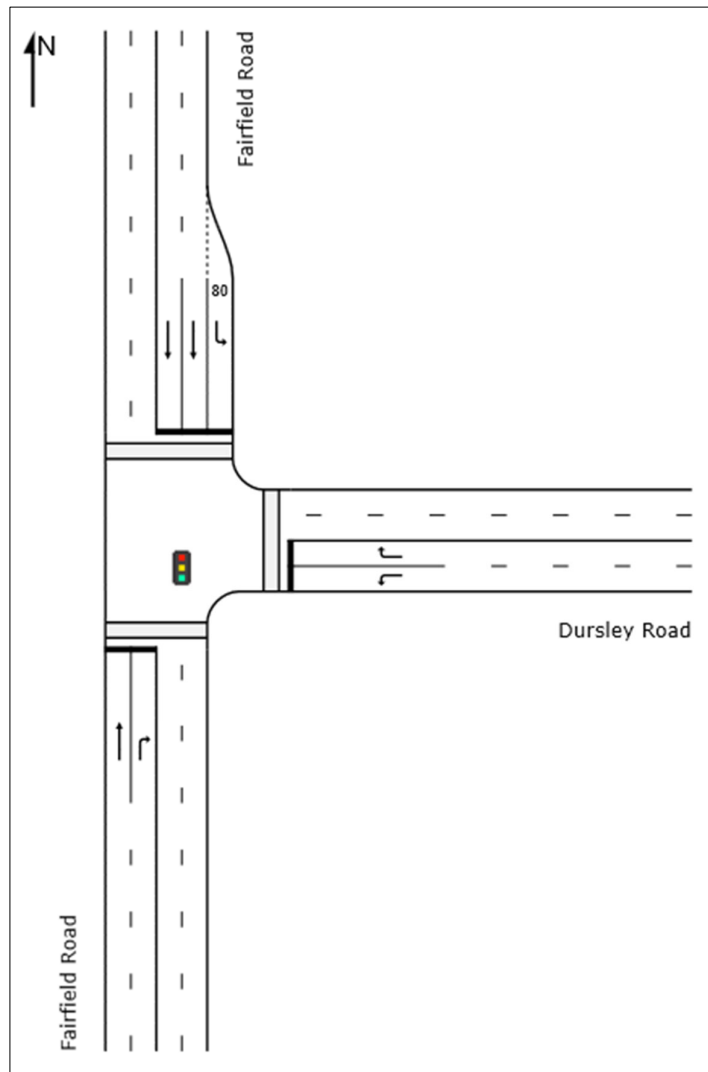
Signalised Intersection of Fairfield Road with Dursley Road (SIDRA)
